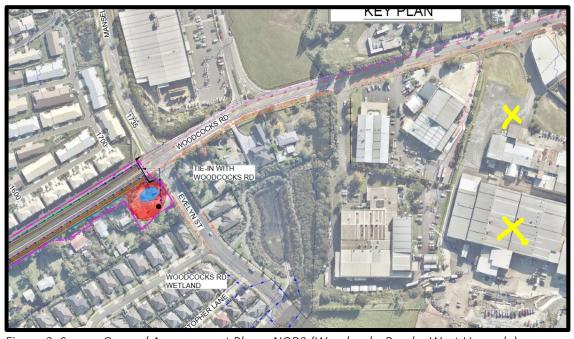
Source General Arrangement Plan – NOR2 (Woodcocks Road – West Upgrade)
